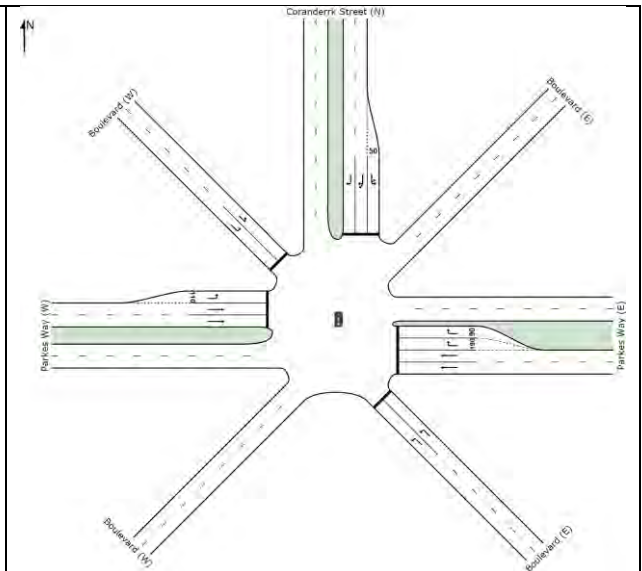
UDS Fesibility Design Parkes Way - Boulevard – Coranderrk Street Intersection
